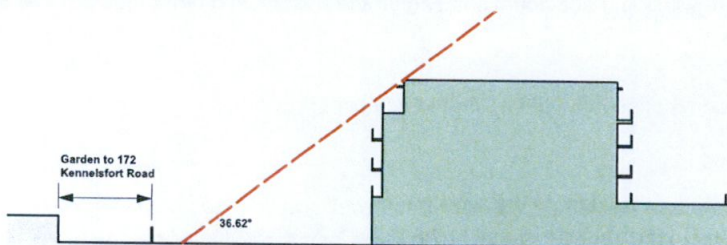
Section indicating the extent of the shadow cast at 12noon on the 21st March towards 172 Kennelsfort Road and 215A Palmerstown Avenue.
